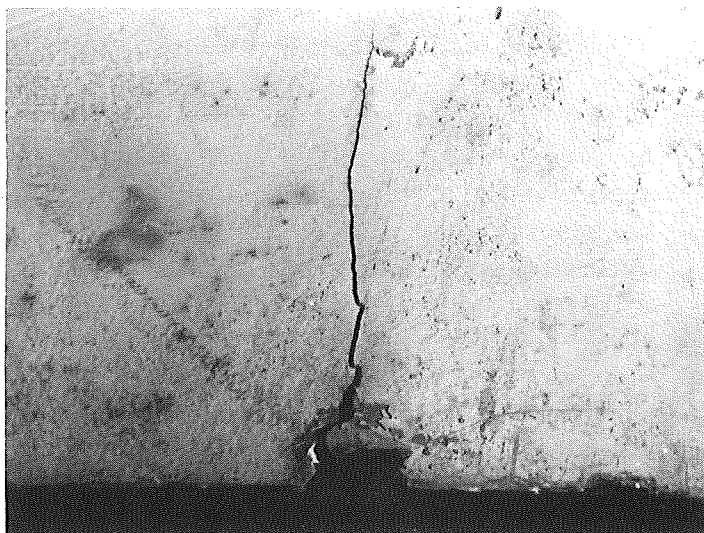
Fracture at the point of impact on the first interior beam. Crack is shown running through the flange and part way up the web.
